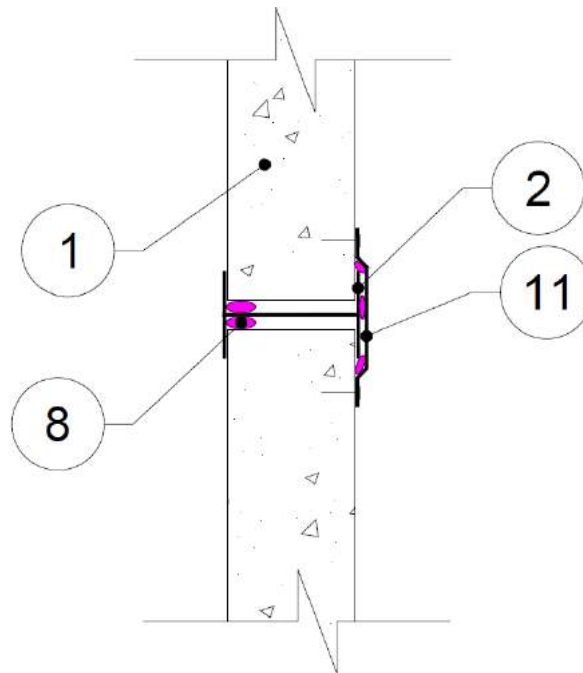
Metal Flashing Protection of Junction for 51mm and 78mm Panel
